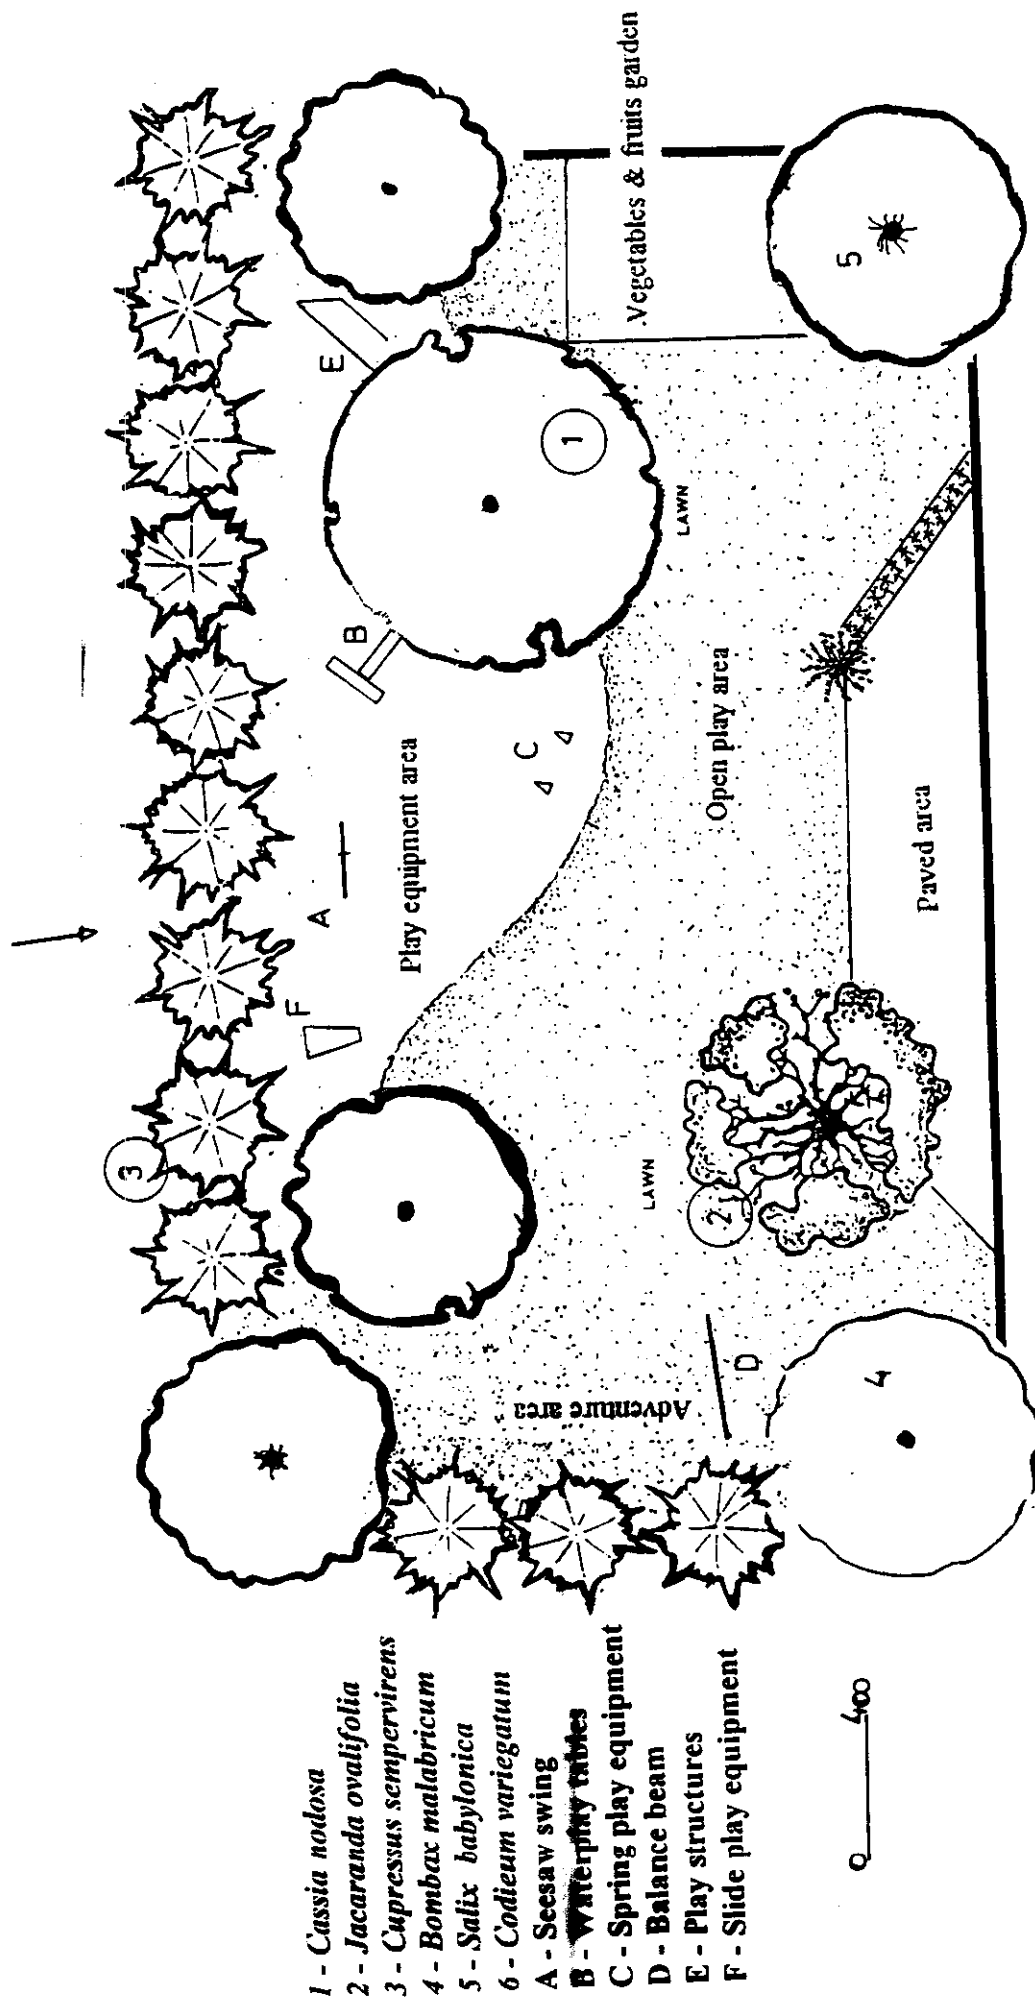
A proposed design for kindergarten garden in an area 400 m .
